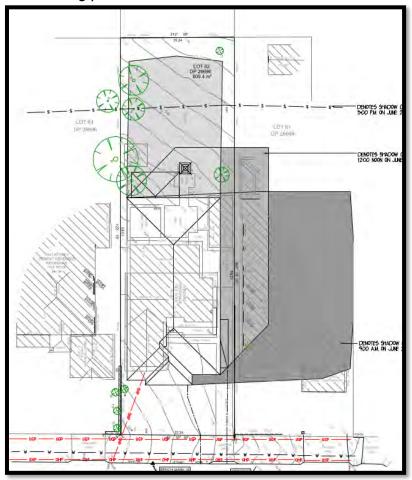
Plan detailing degree of overshadowing caused by development between 9am and 3pm on June 21.
